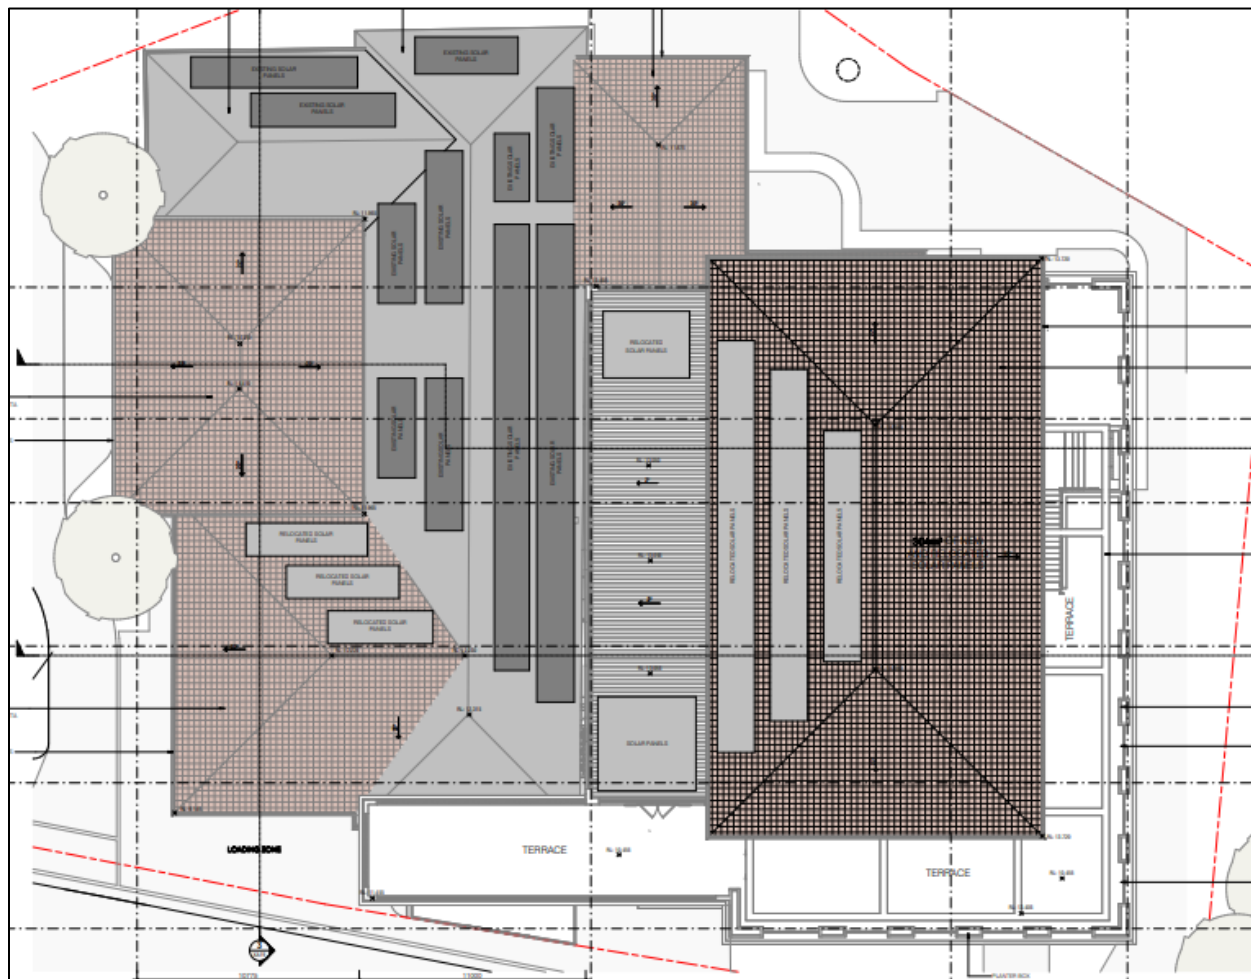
Proposed Roof Plan (Source: i2C; 2025)
